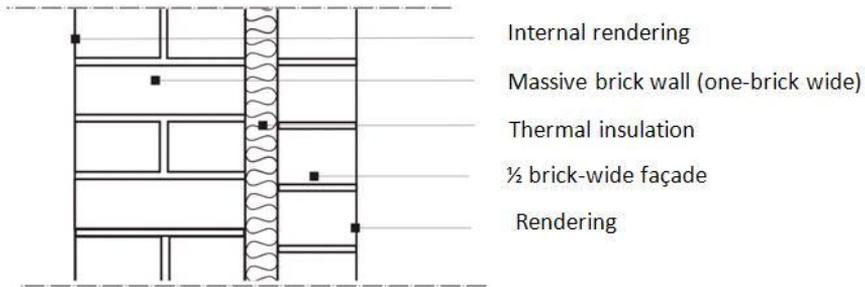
Massive brick wall with external light-weight concrete insulation. Original structure and renovation with additional thermal insulation.
